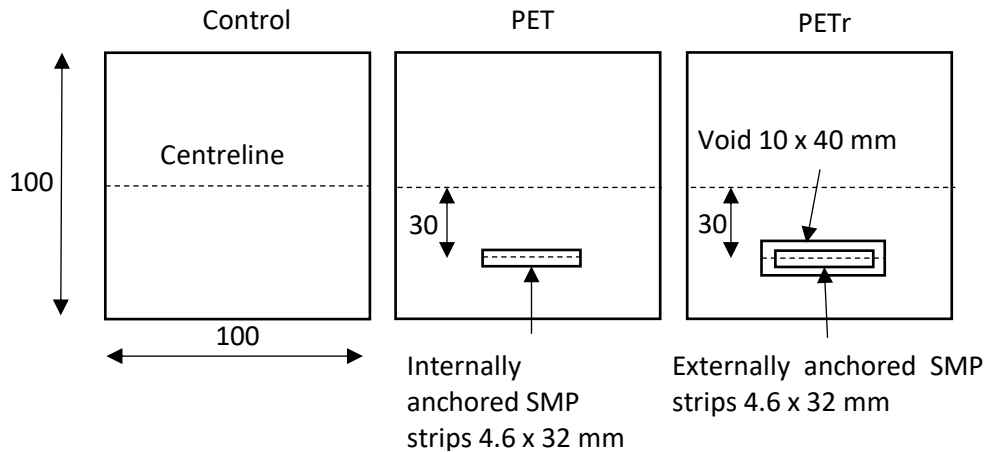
Cross-sections of the beam samples used within PET strip tests.
